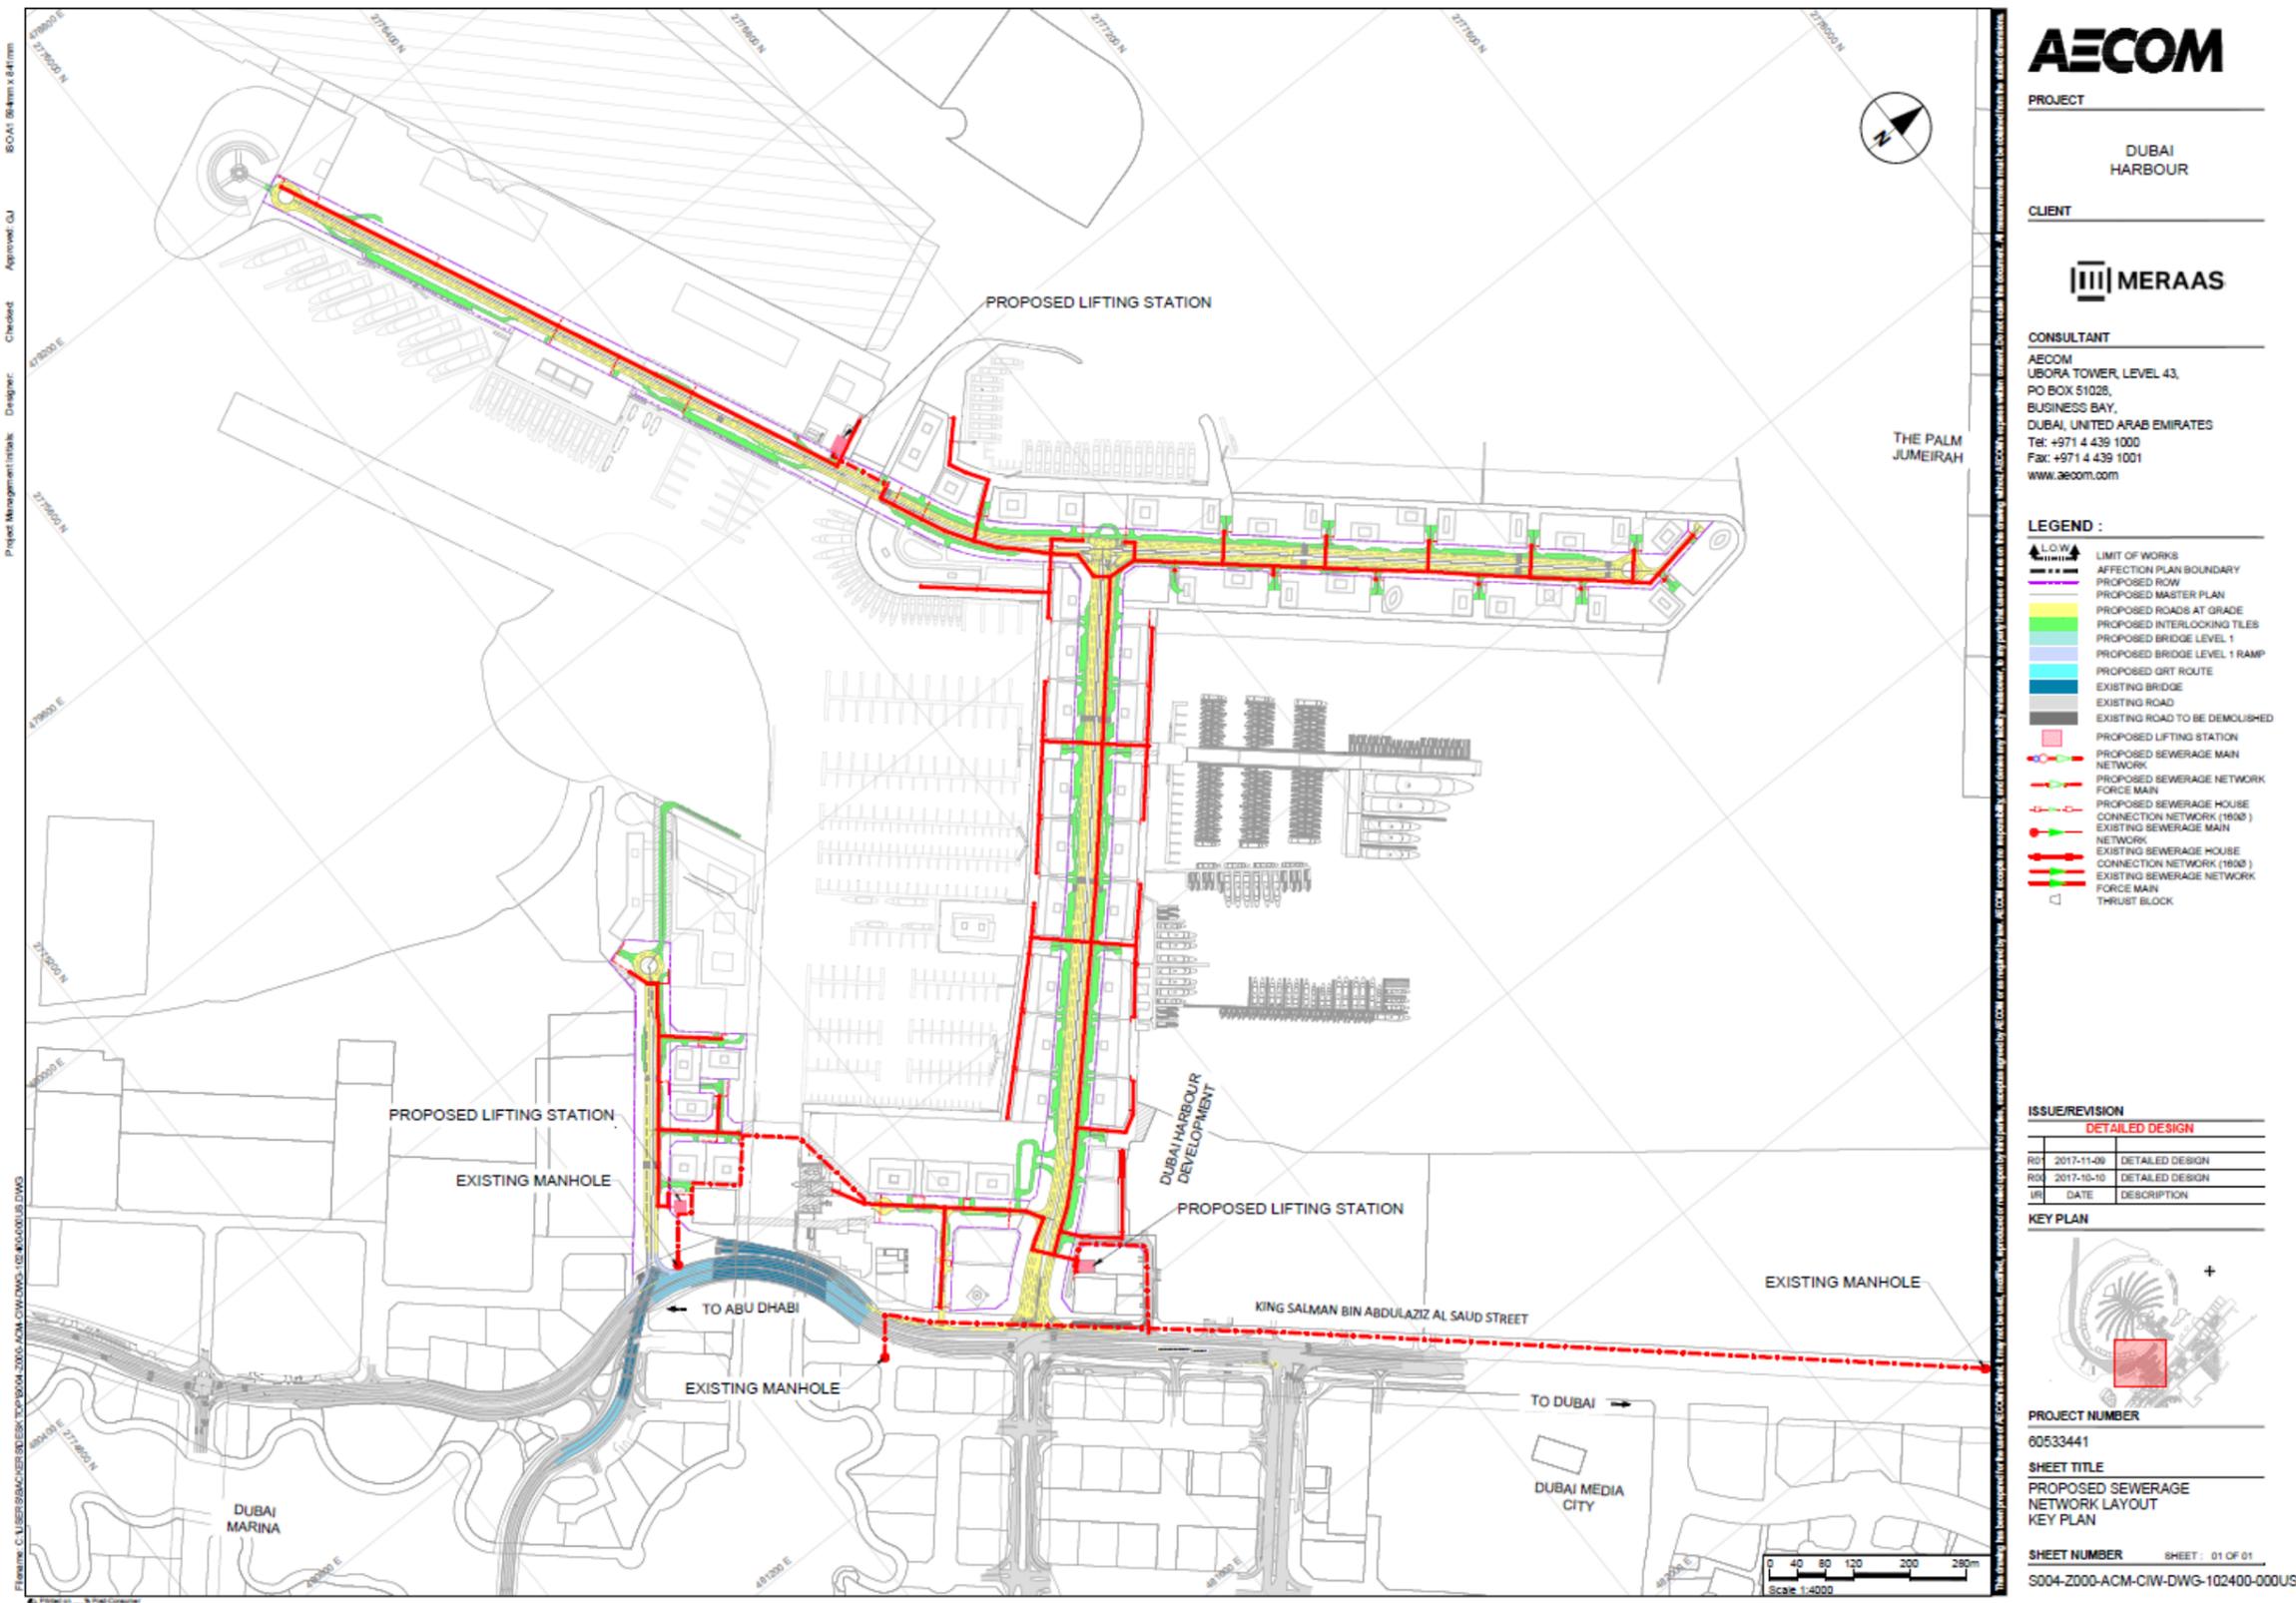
Proposed Sewerage Network Lay-out Key Plan
